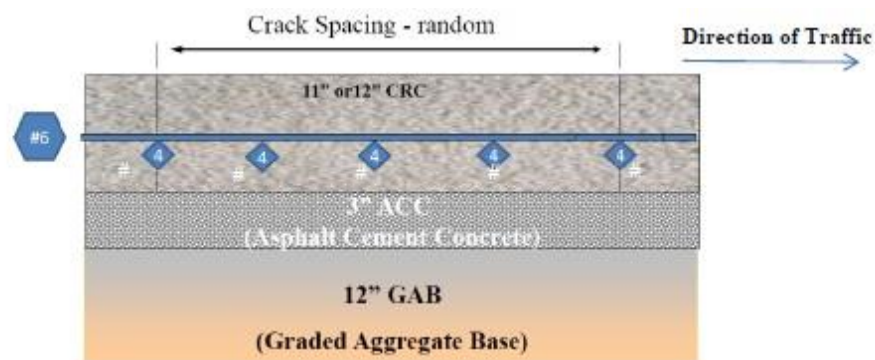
CRCP Section in GDOT (Tsai and Wang 2014)
